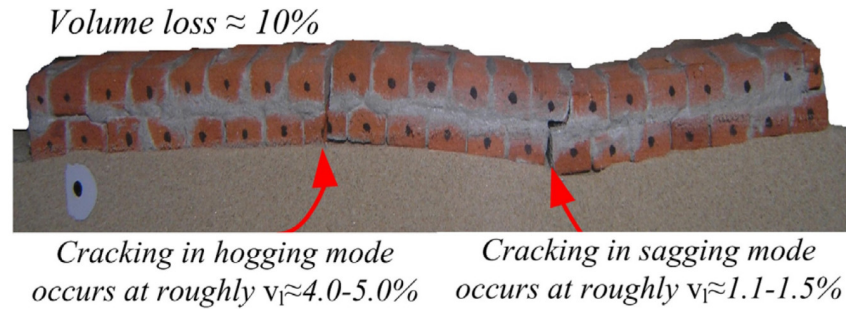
Observed cracking of masonry model in centrifuge testing (Farrell et al., 2014)
